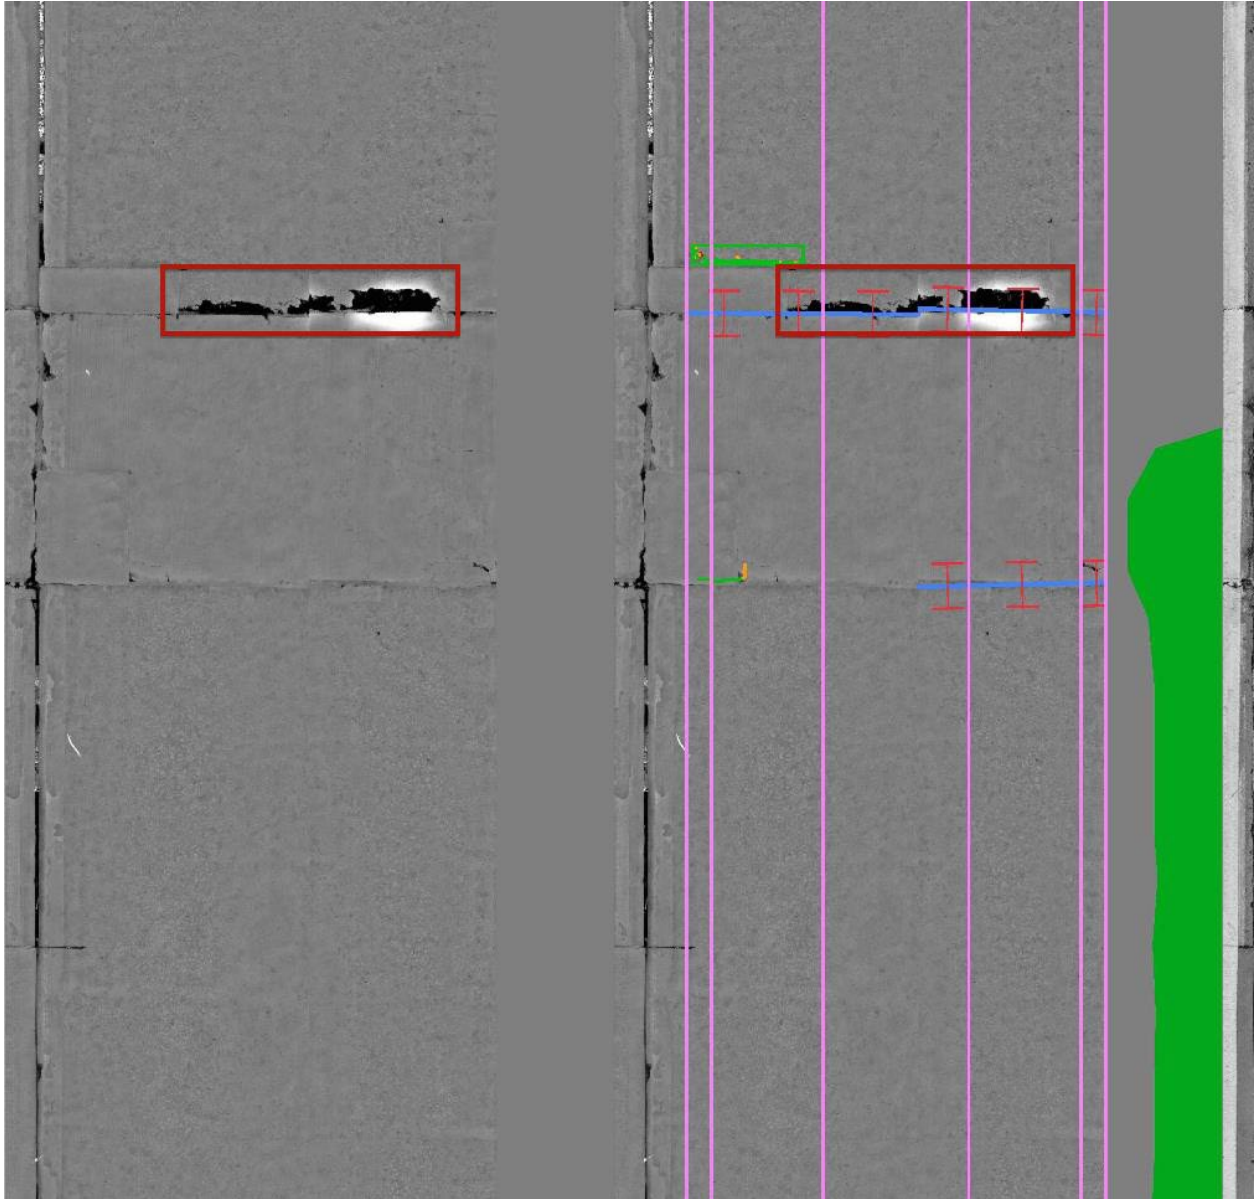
Low-severity joint deterioration is characterized by spalls less than 3 inches wide with no significant loss of material. Single cracks in the corner of the slab will be counted toward cracking.
